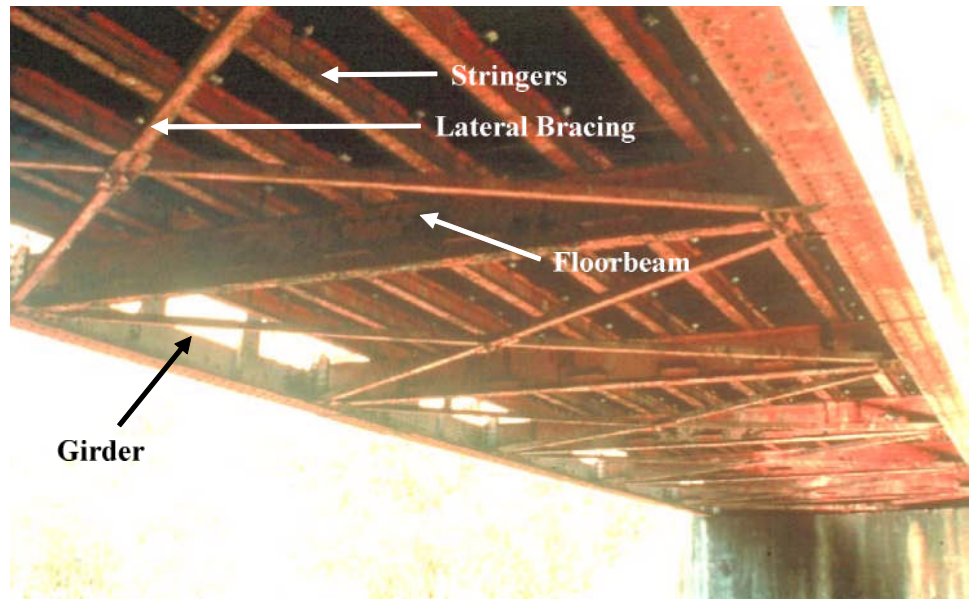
Underside View of Through Girder Bridge with Lateral Bracing
